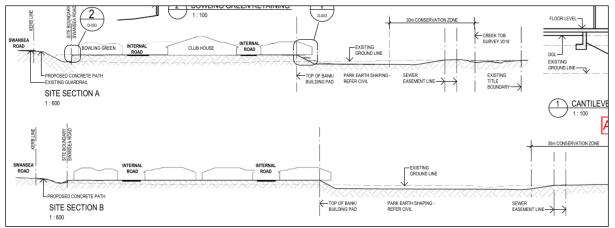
Streetscape presentation to Swansea Road Part 3 elevation
